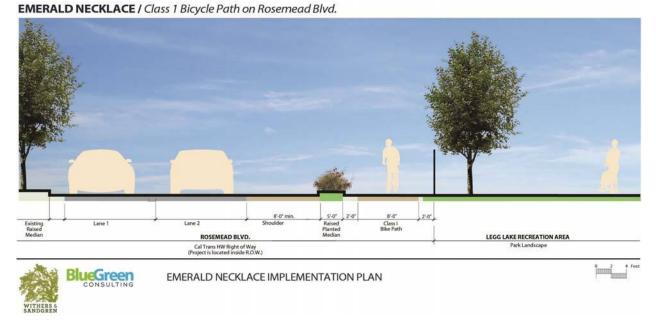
Section view of the Class I bike path on Rosemead Blvd., looking north.
